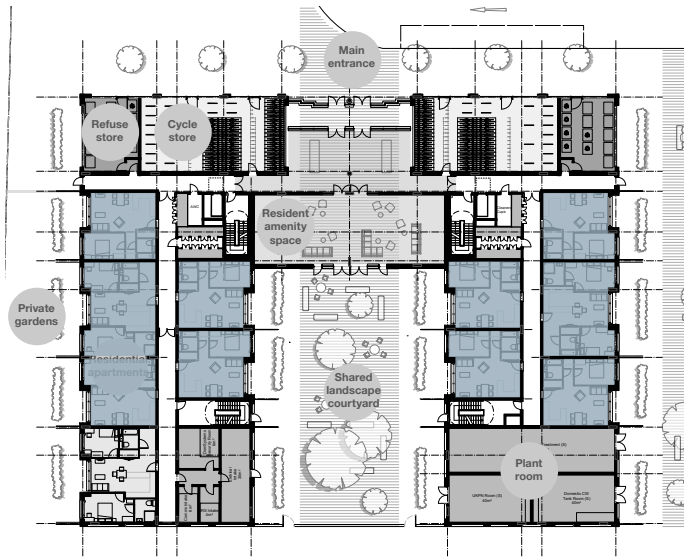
Single Aspect Study of previous masterplans residential layouts, Plan Ground floor level
